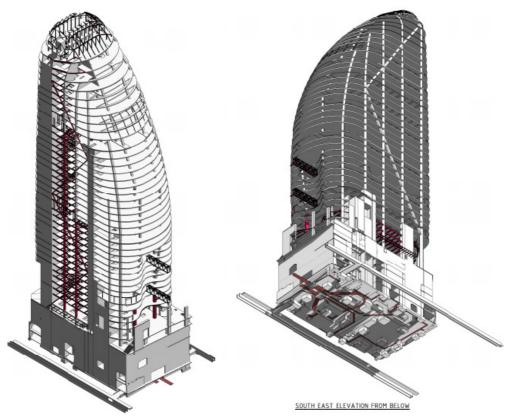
North Tunnel and Northern Concourse perspectives describing an integrated design from foundation level to rooftop. The new tunnels are adjacent to the shaft and the foundation soffits.
